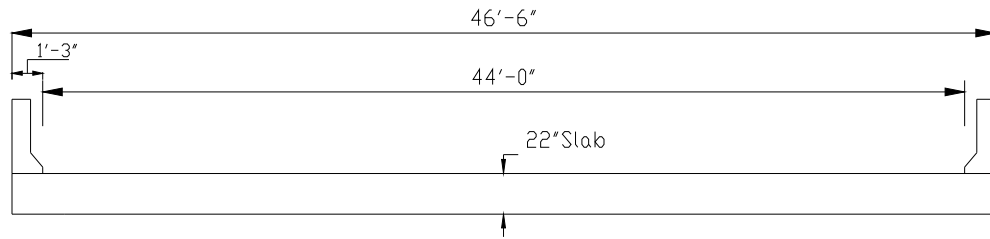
Solid Slab Bridge Cross Section (Barker 2007).
